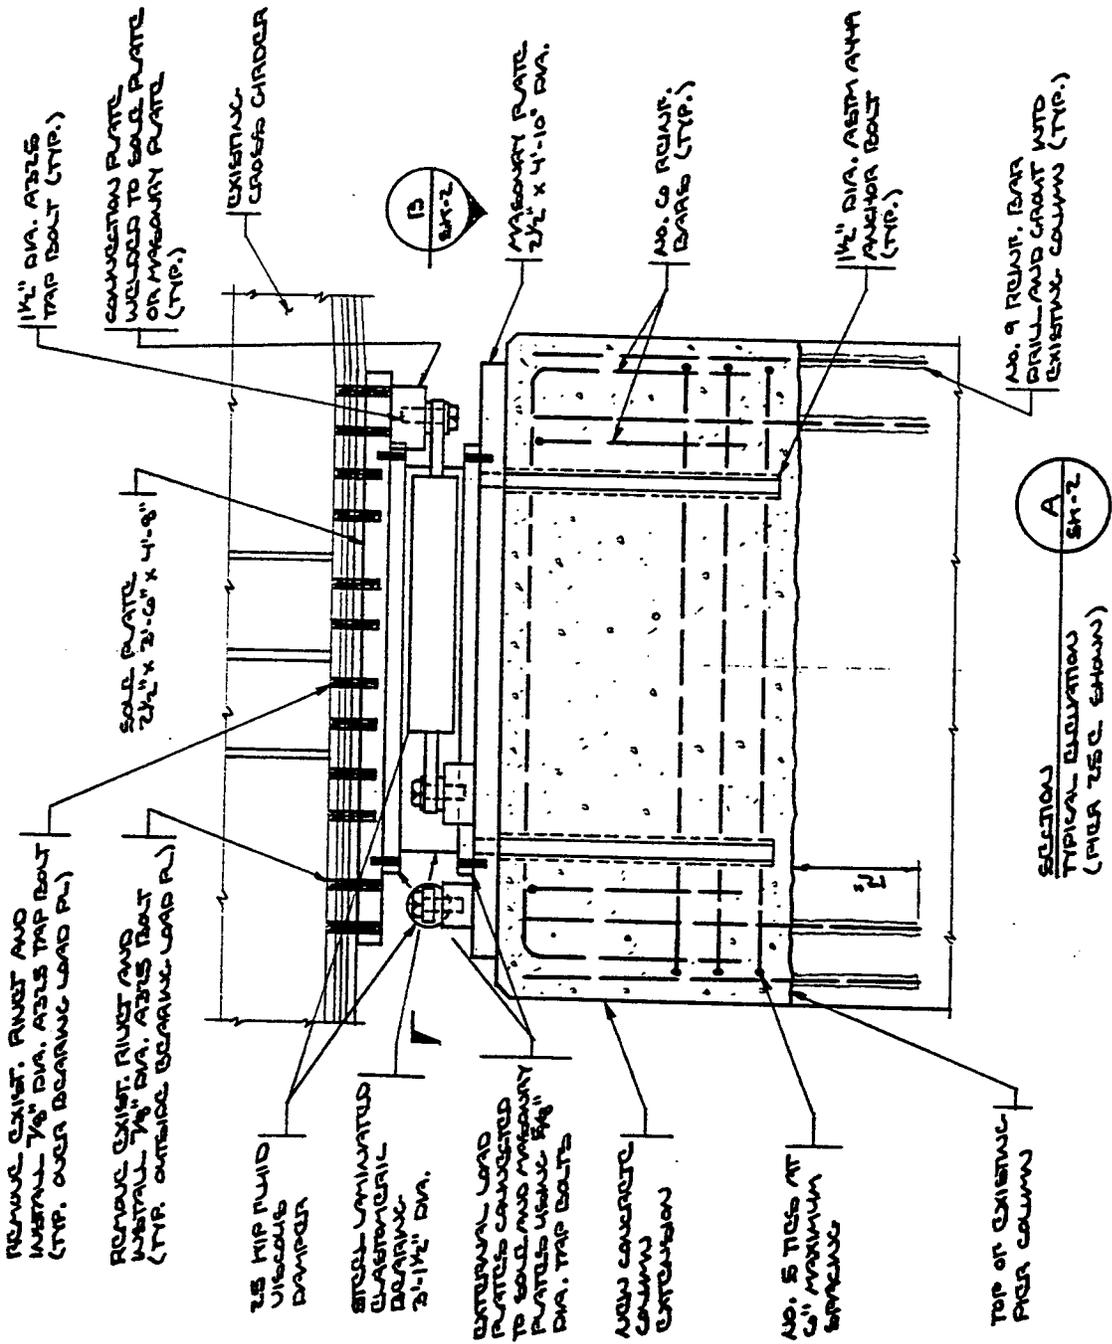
Martin Luther King Bridge, Elevation of Proposed Viscous Fluid Damper System and Elastomeric Bearing
